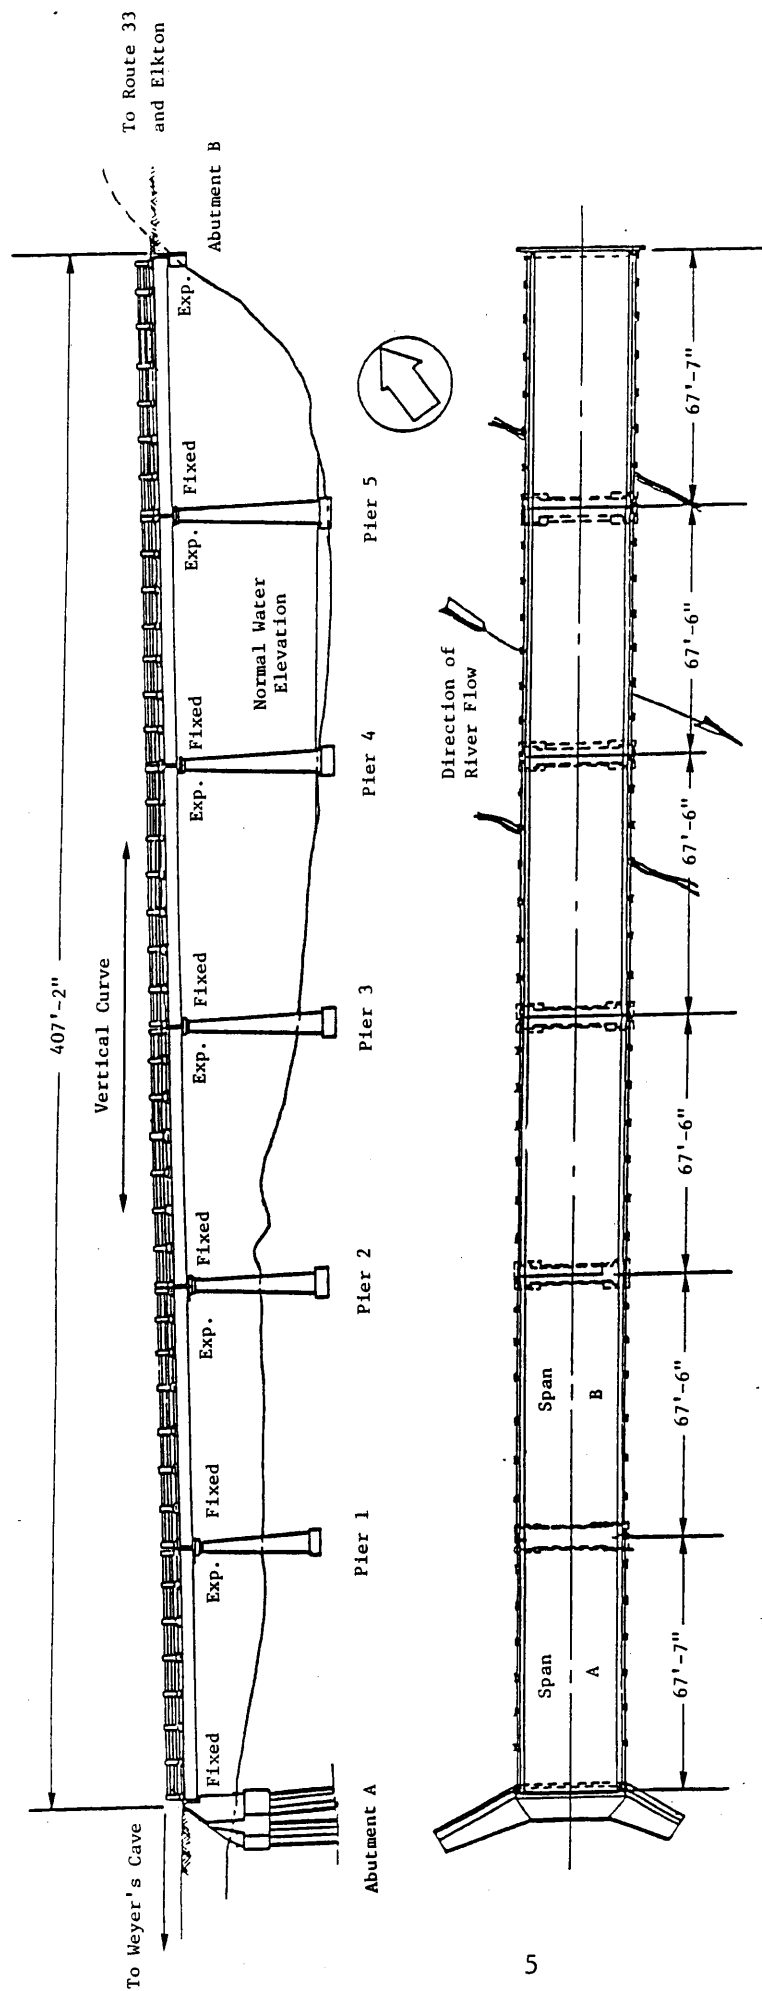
Profile and plan of Weyer's Cave Bridge, indicating test sections.
